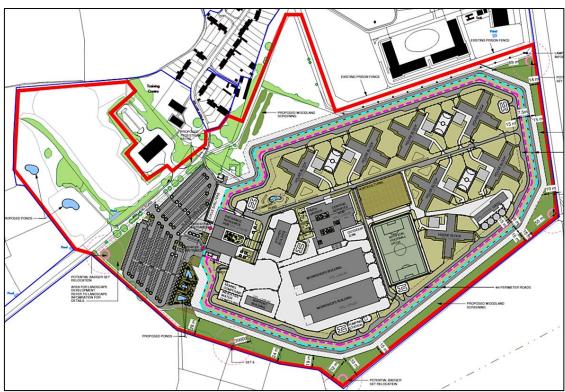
Proposed Site Block Plan submitted in support of 21/01600/OUT
